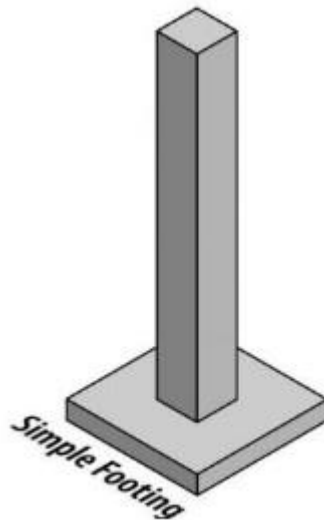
Flat, Plain, or Reinforced Isolated Footing
